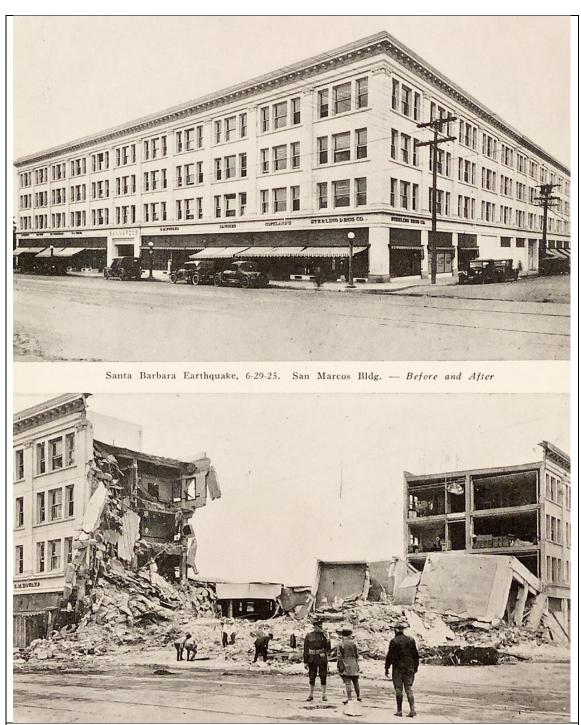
Postcard photographs of before and after the earthquake of the four-story San Marcos Building. Sylvester and Mendes (2001) note that the building was constructed in several sections that were not structurally tied together, and they suggest that battering of the two wings occurred during the shaking. Two people were killed in the collapse of the building. Only one wing of the building was rebuilt and it is now a two-story building. The San Marcos building is located on the southeast corner of State Street and Anapamu Street. Photo credit: Santa Barbara Historical Museum, Gledhill Library.
